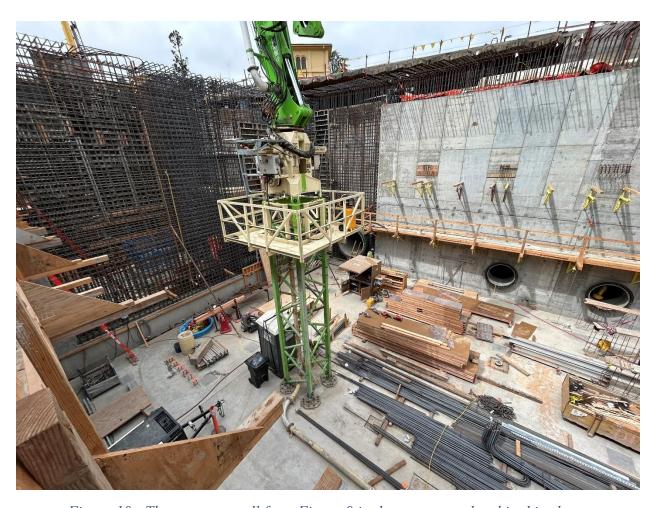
The concrete wall from Figure 9 is shown as completed in this photo.
